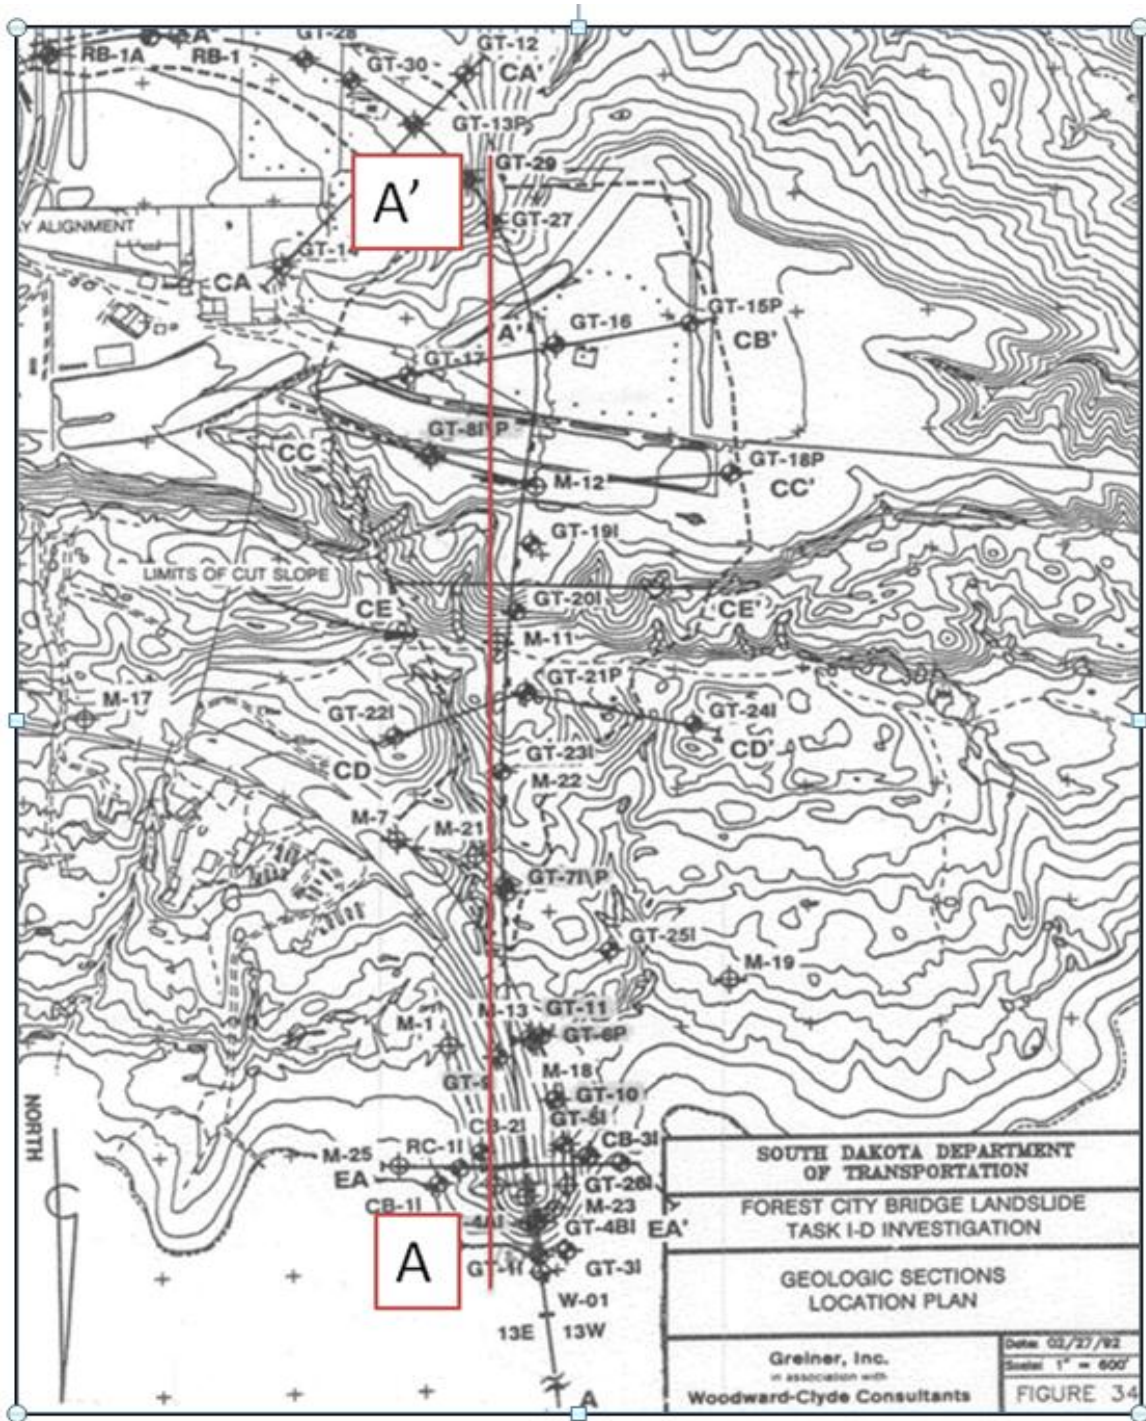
Plan view of section AA' (adopted from Grenier and Woodward Consultants 1991) (not to scale)
